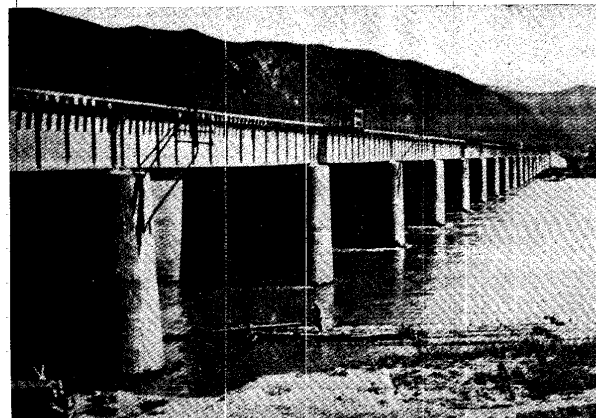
Tuman-gang between Namyang, Korea and T'u-men, Manchuria*. Plate deck girder bridge.
